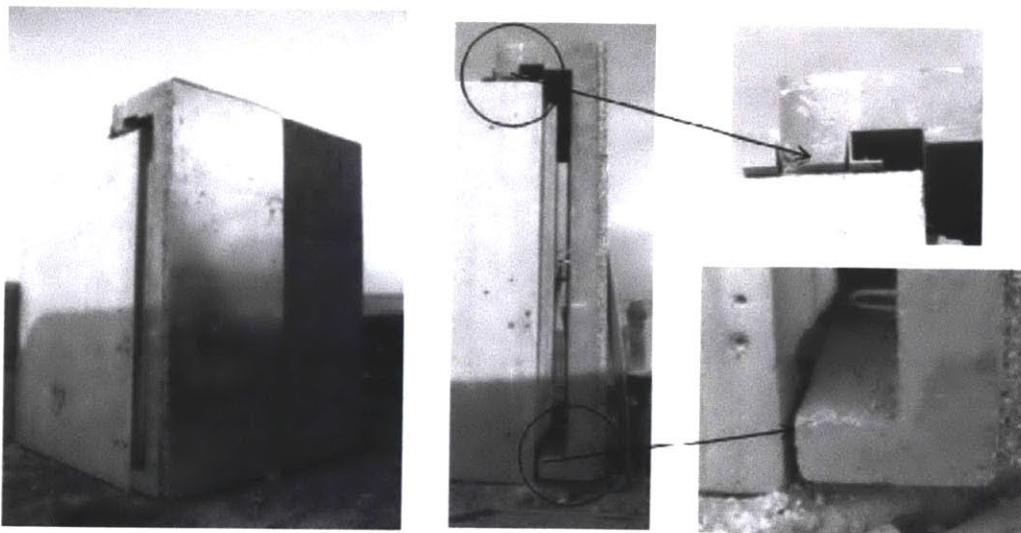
Concrete Blast Test Setup (Source: Schenker et al.)
